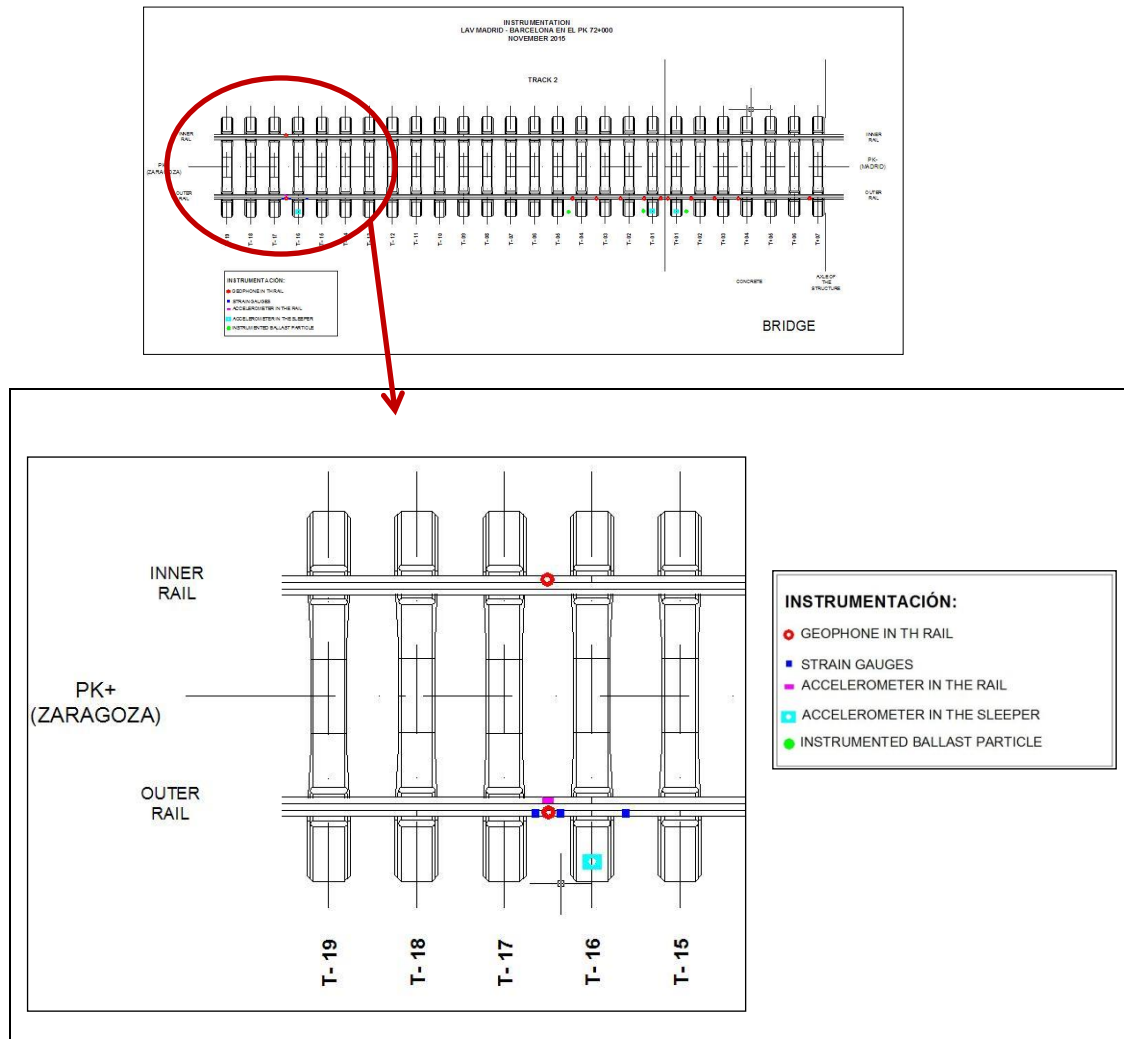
SKETCH OF THE INSTRUMENTED SECTION LOCATED AT 10 M FROM THE BRIDGE
